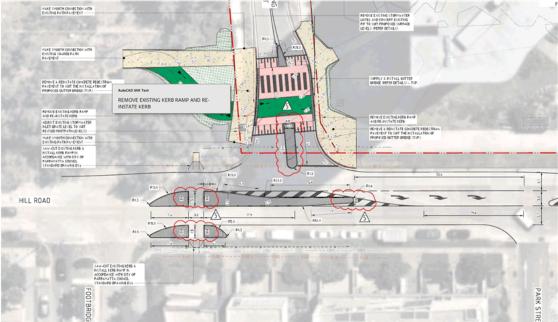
Plan showing the pedestrian refuge island and pedestrian crossings at the intersection of Hill Road and Wattlebird Road, Wentworth Point
